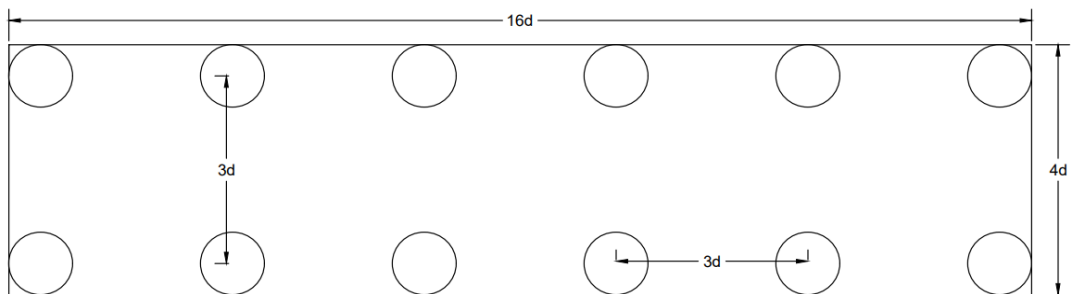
12 pile arrangement with 64 sqm. Raft size
